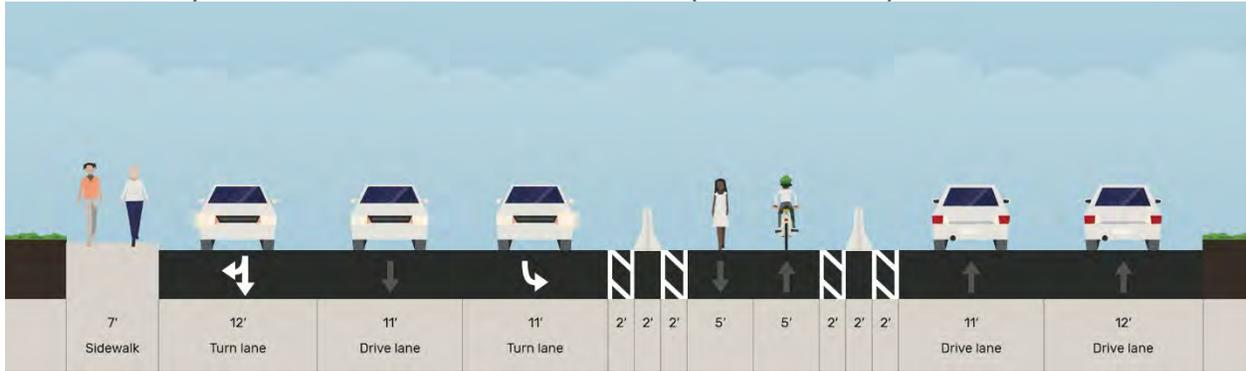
Concepts 1 & 2 with Alternative 2 – Pleasant Hill Road Cross Section (Northern Section) Retain NB Right-Turn Lane
